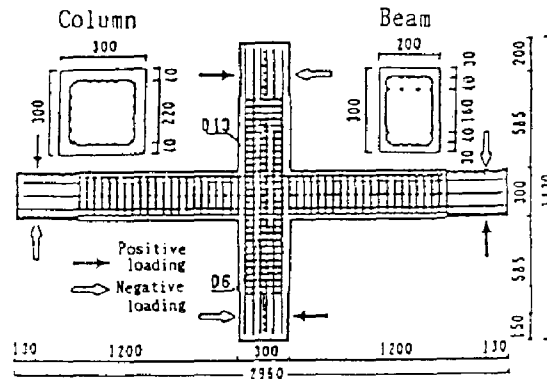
Arrangement of Reinforcement (OKJ-1)
